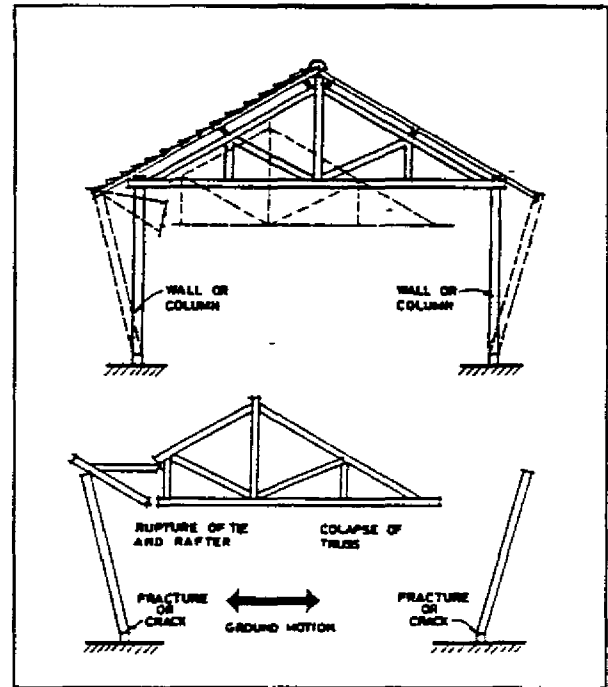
Failure due to Rupture of Bottom Chord of Roof Truss
